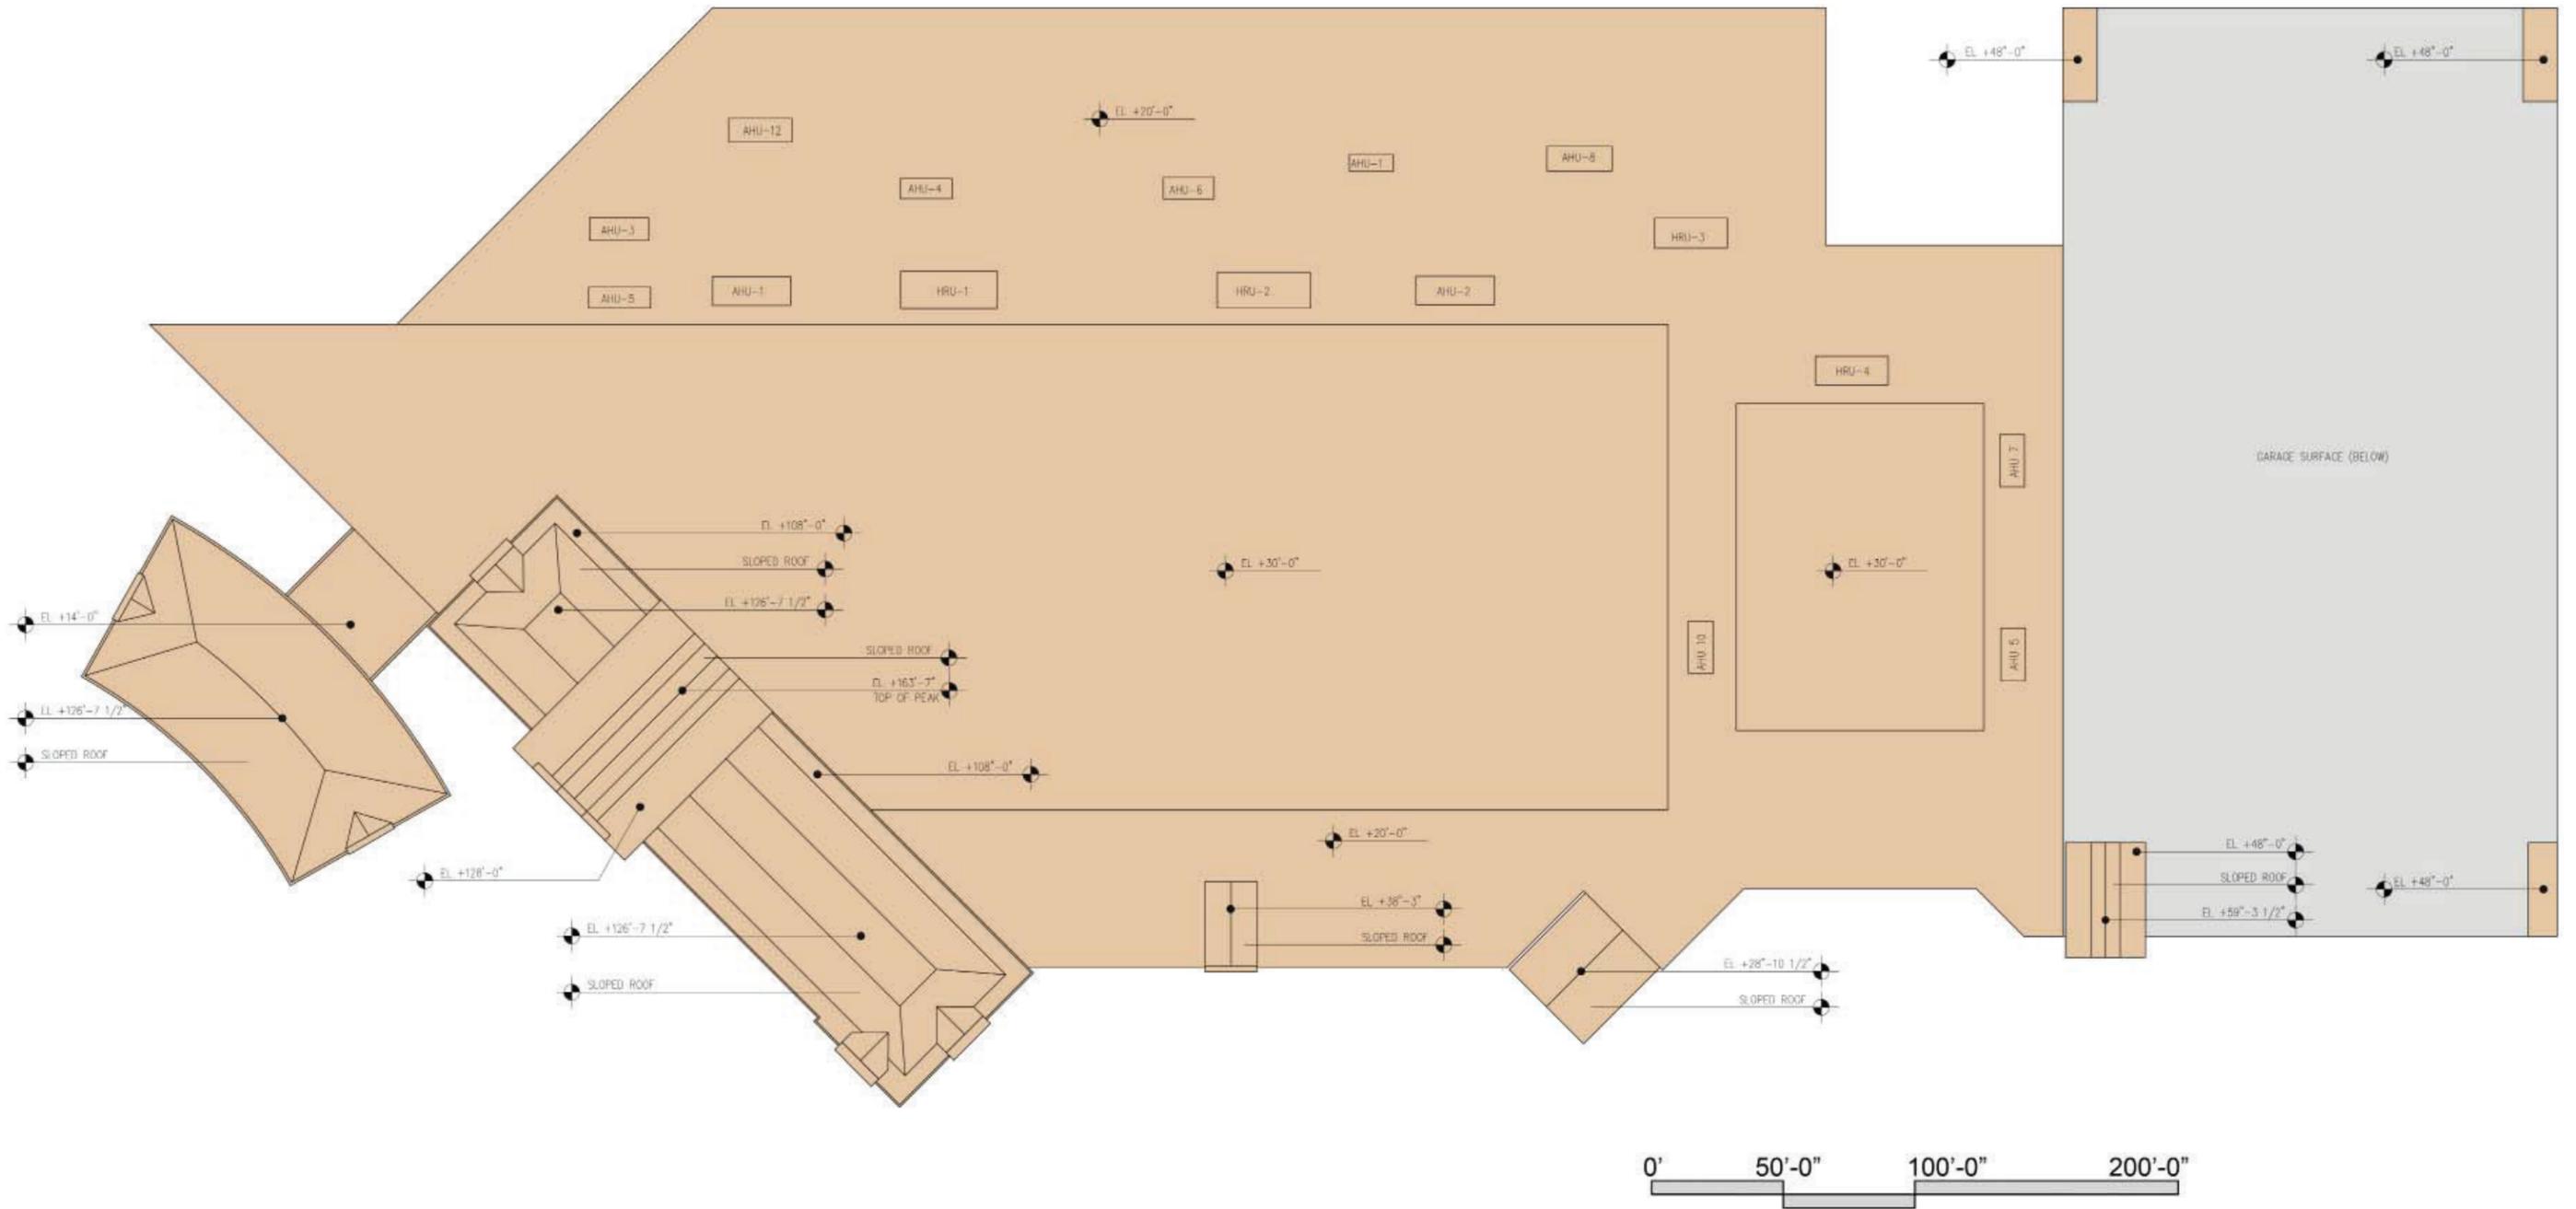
a.3 – Building Elevations and Perspectives
